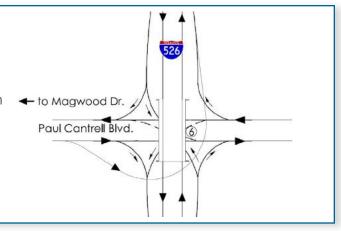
I-526 at Paul Cantrell Blvd Alternative 4
